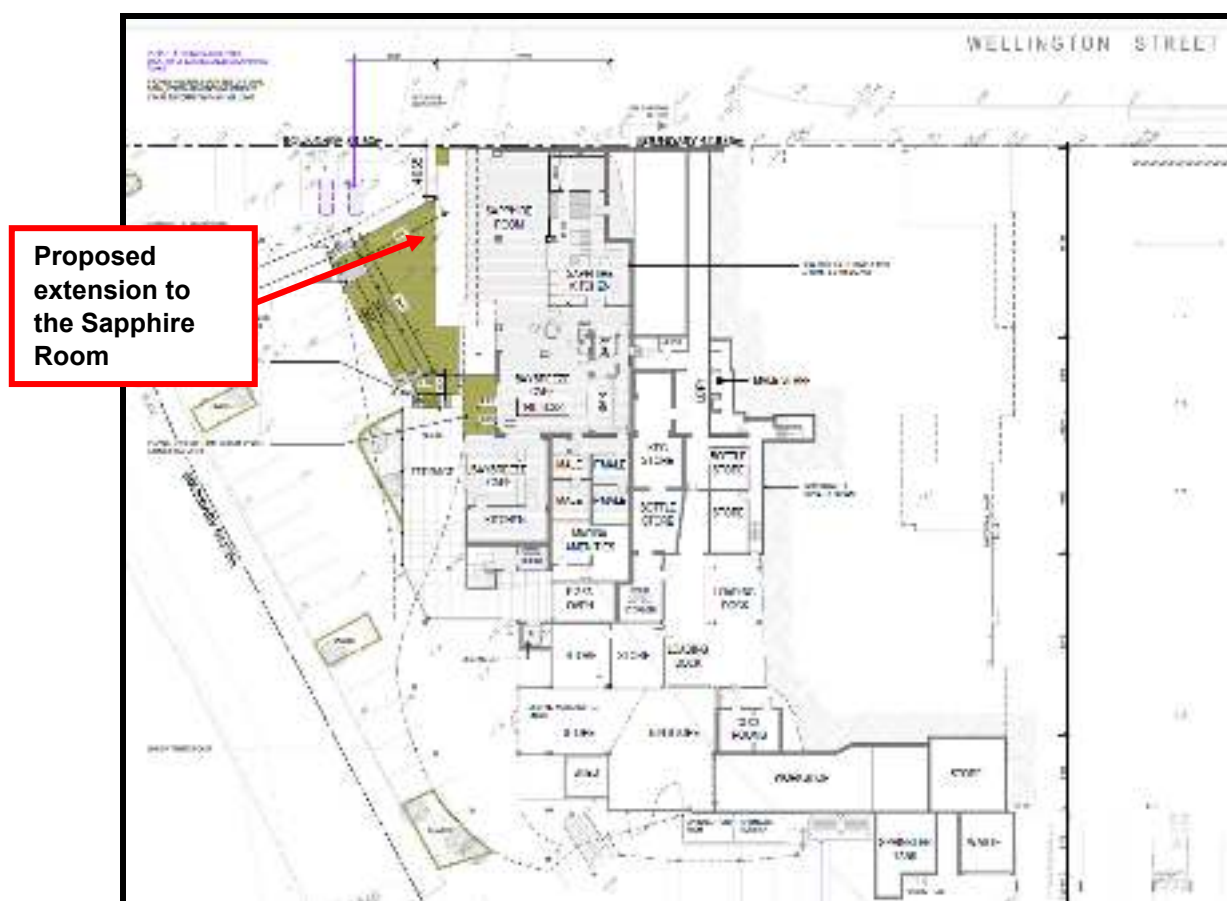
Proposed lower ground floor (Source: Innovate, Rev C, July 2024)
